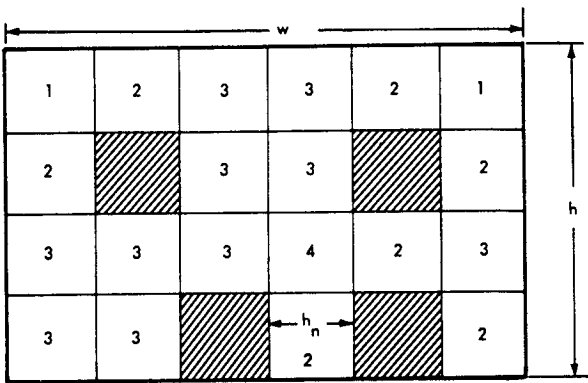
Subdivision of the Front Wall of a Structure with Openings
